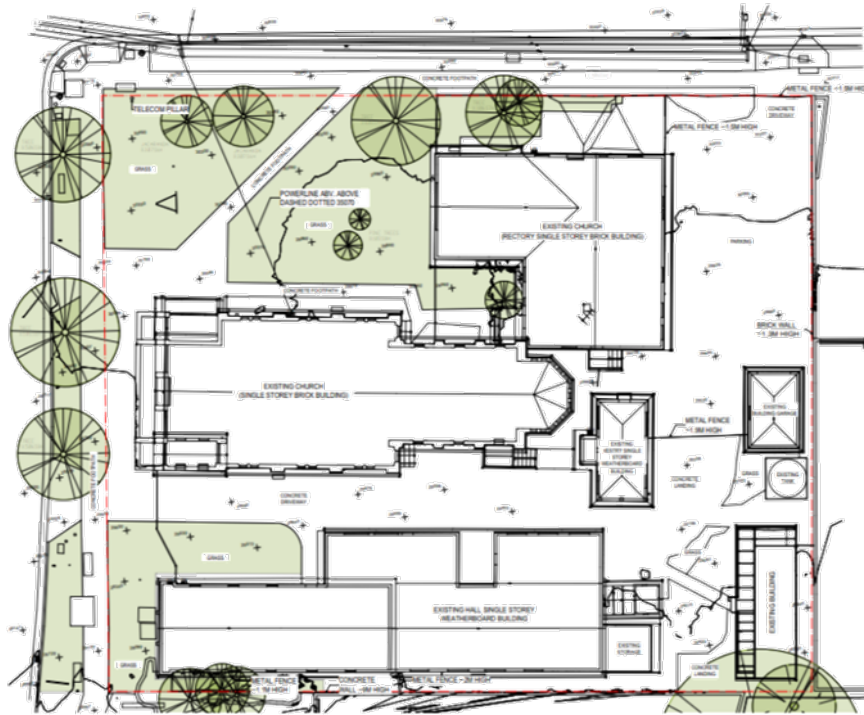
Existing site structures Source: Architectural Plans DA-438/2025
